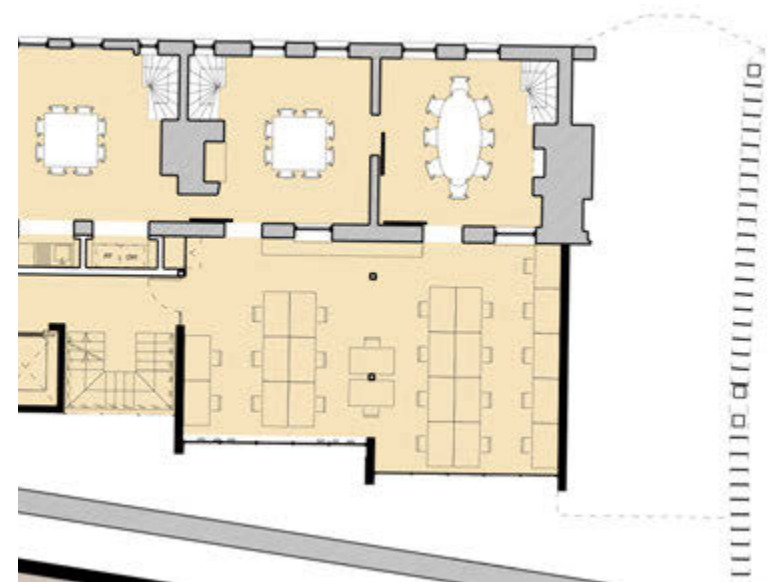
Weavers Cottages - Proposed First floor plan
